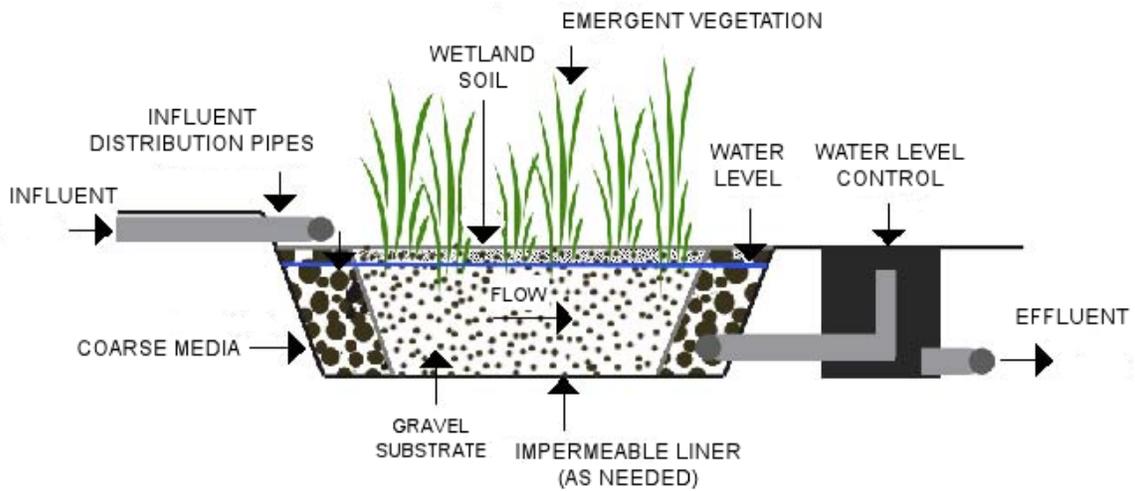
Typical Submerged Gravel Wetland Profile View
